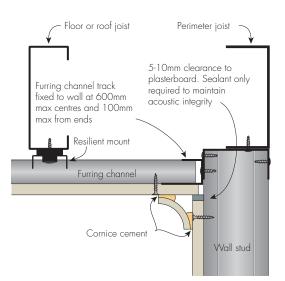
Ceiling to Wall Resilient mount and furring channel
